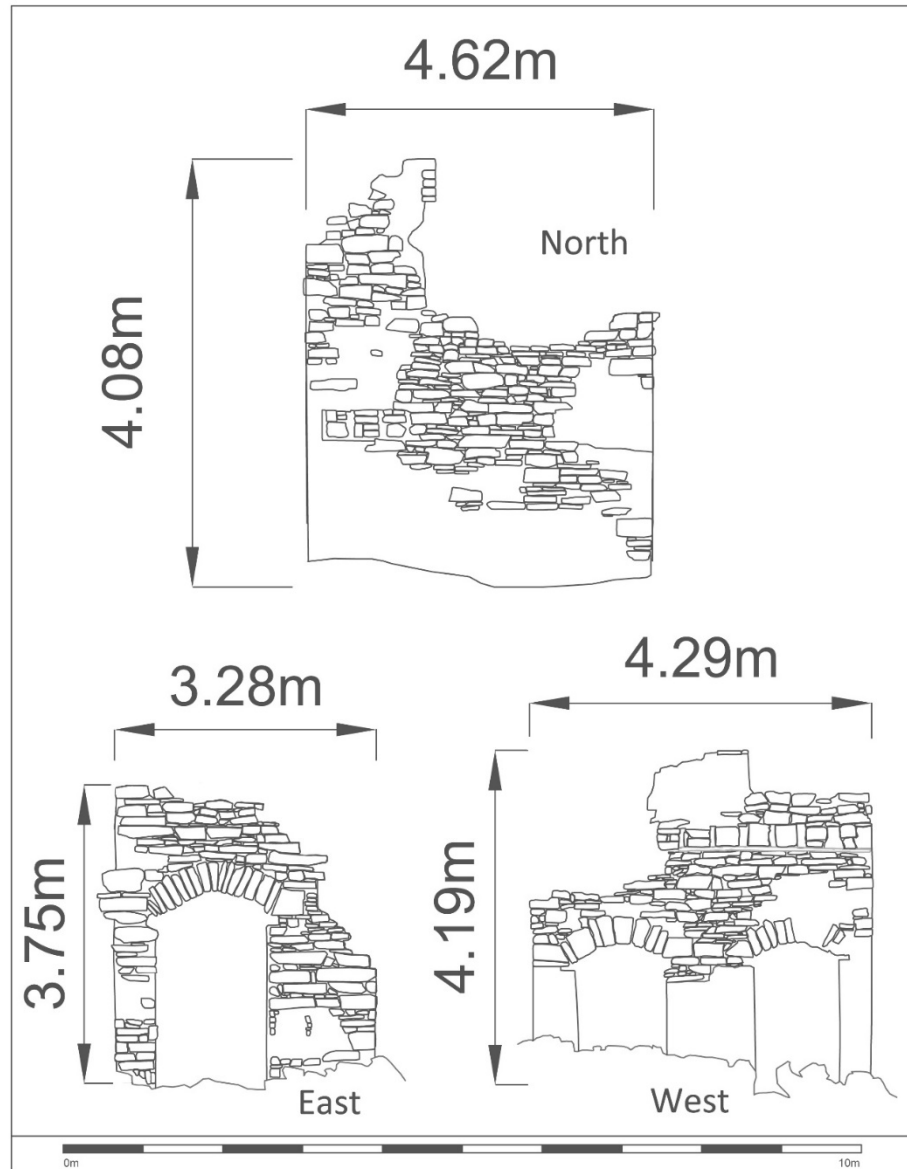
Internal elevations of the north, east and west walls of the signal tower at Horn Head Signal Station.
